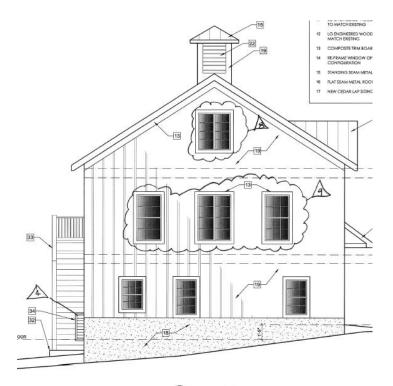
East elevation showing the proposed 2nd-floor window revisions.
